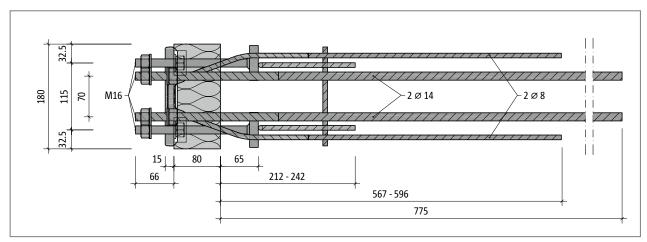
Schöck Isokorb® T type SK-M1-V1: Plan view
